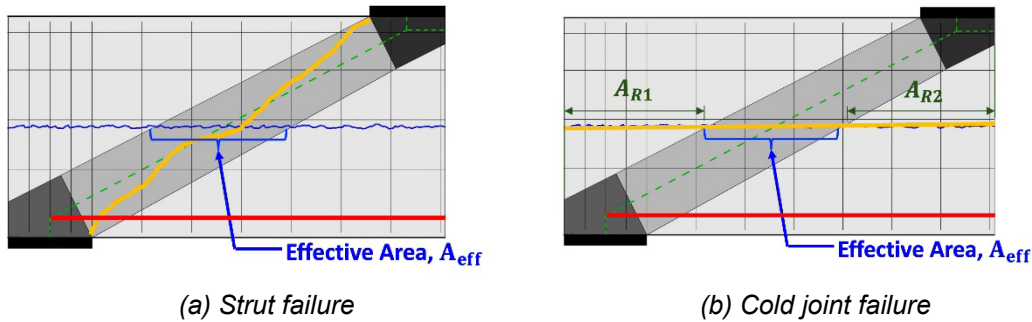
Potential failure mechanisms for deep beams with horizontal cold joints
